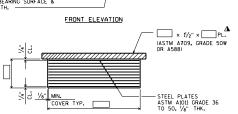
PLATE 'E' DETAILS (SEE STD. 40.10 FOR CONCRETE BLOCK ALTERNATE)
